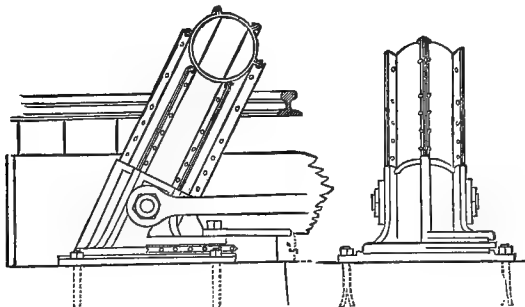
Details of Through Bridge, Shoe of End Strut.
